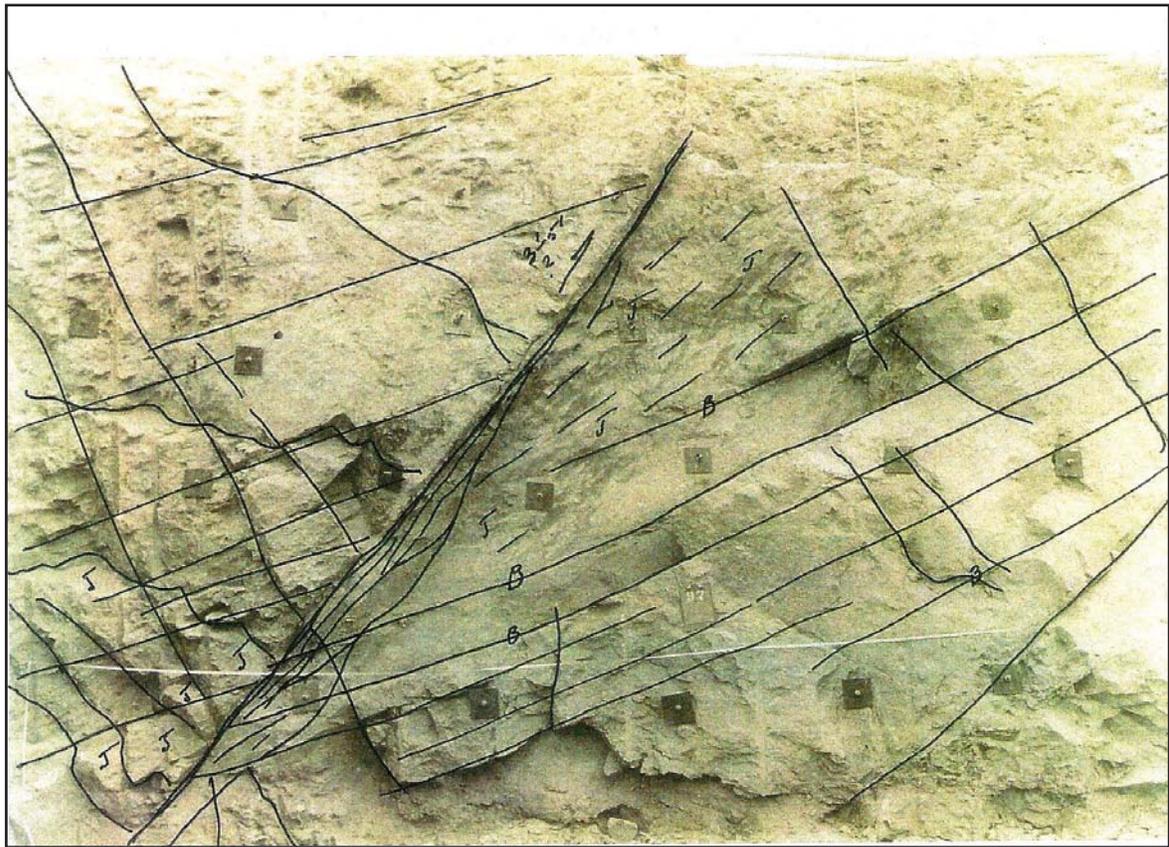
Photographs showing fault features exposed in walls of DCNPP power block and containment foundations excavation.
